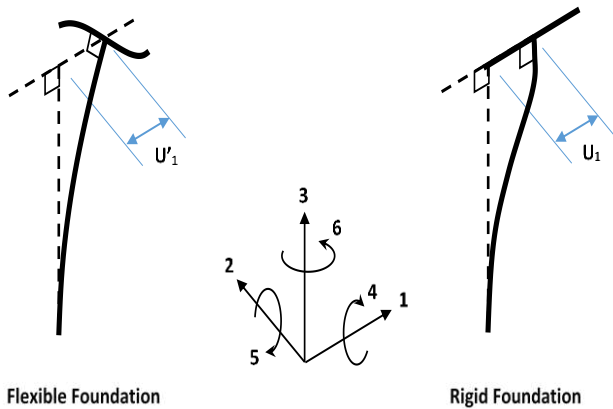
Deformed shape of a pile that is rigidly connected to a flexible foundation versus a rigid foundation (pile-soil-foundation interaction)
